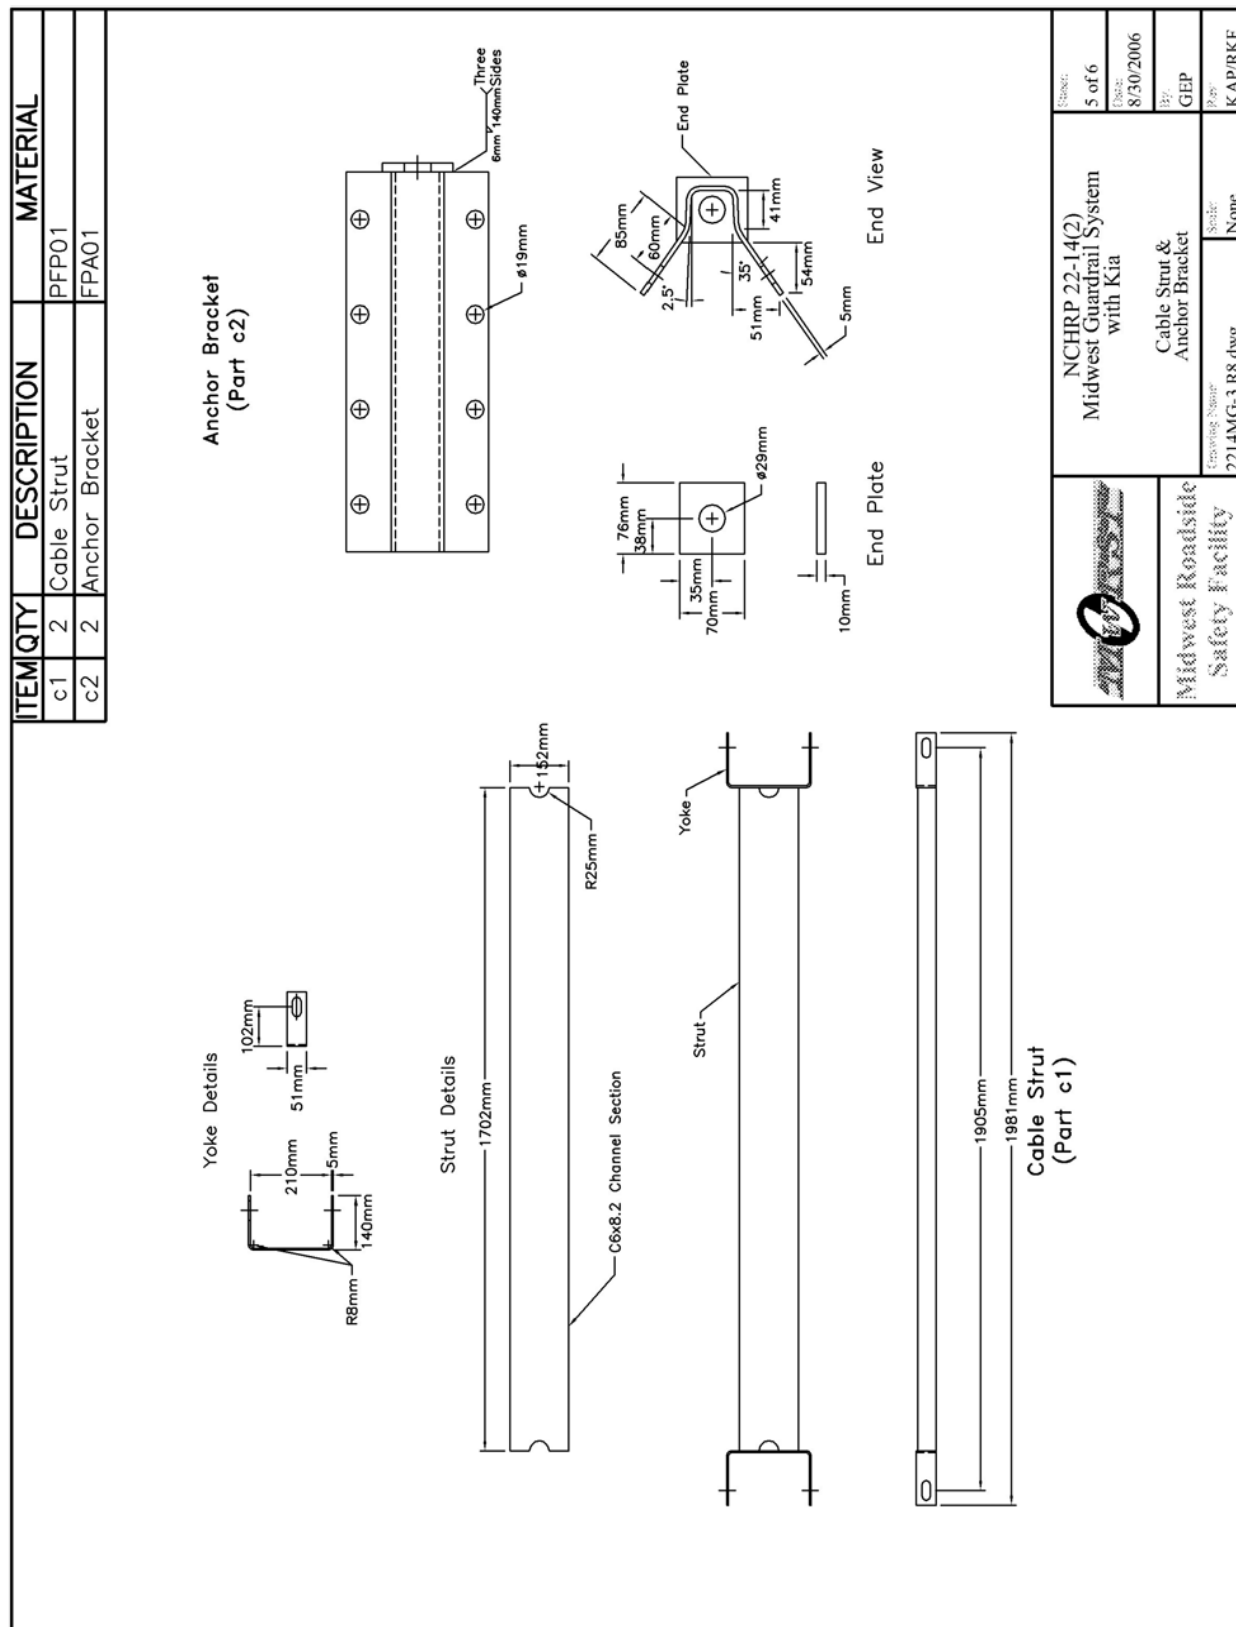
Midwest Guardrail System Anchorage Details - Maximum Height Tolerance
